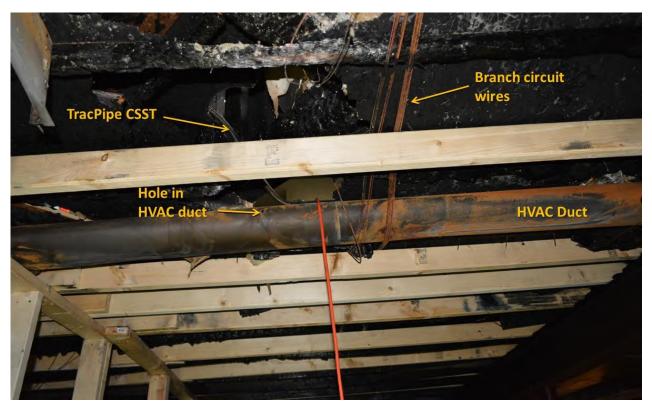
Photograph of the basement ceiling directly below the fireplace. The photographer is looking west. The unburned wooden members were installed for structural shoring after the fire.
